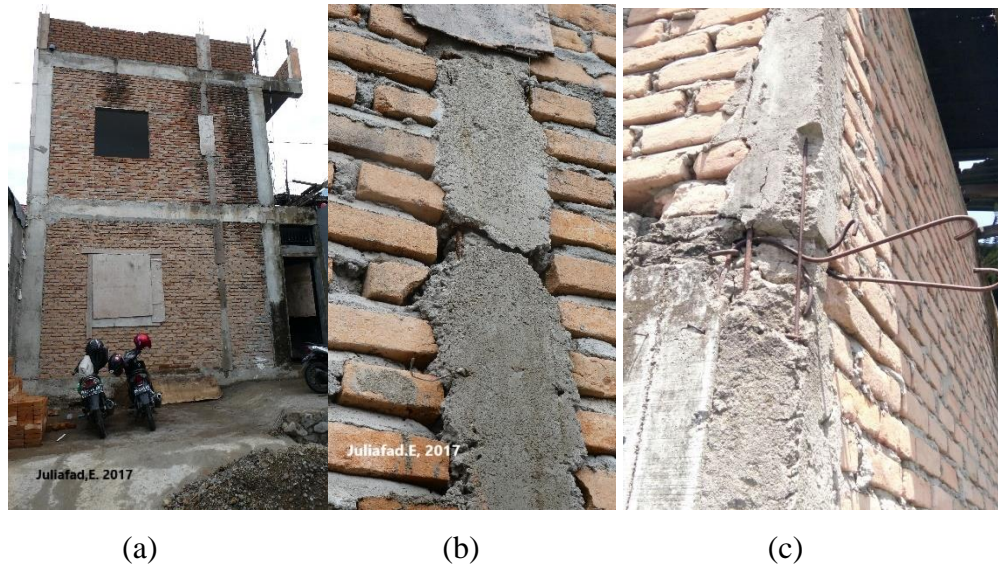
A sample of Improper Casting Results of Concrete at Axial Member from some construction sites
